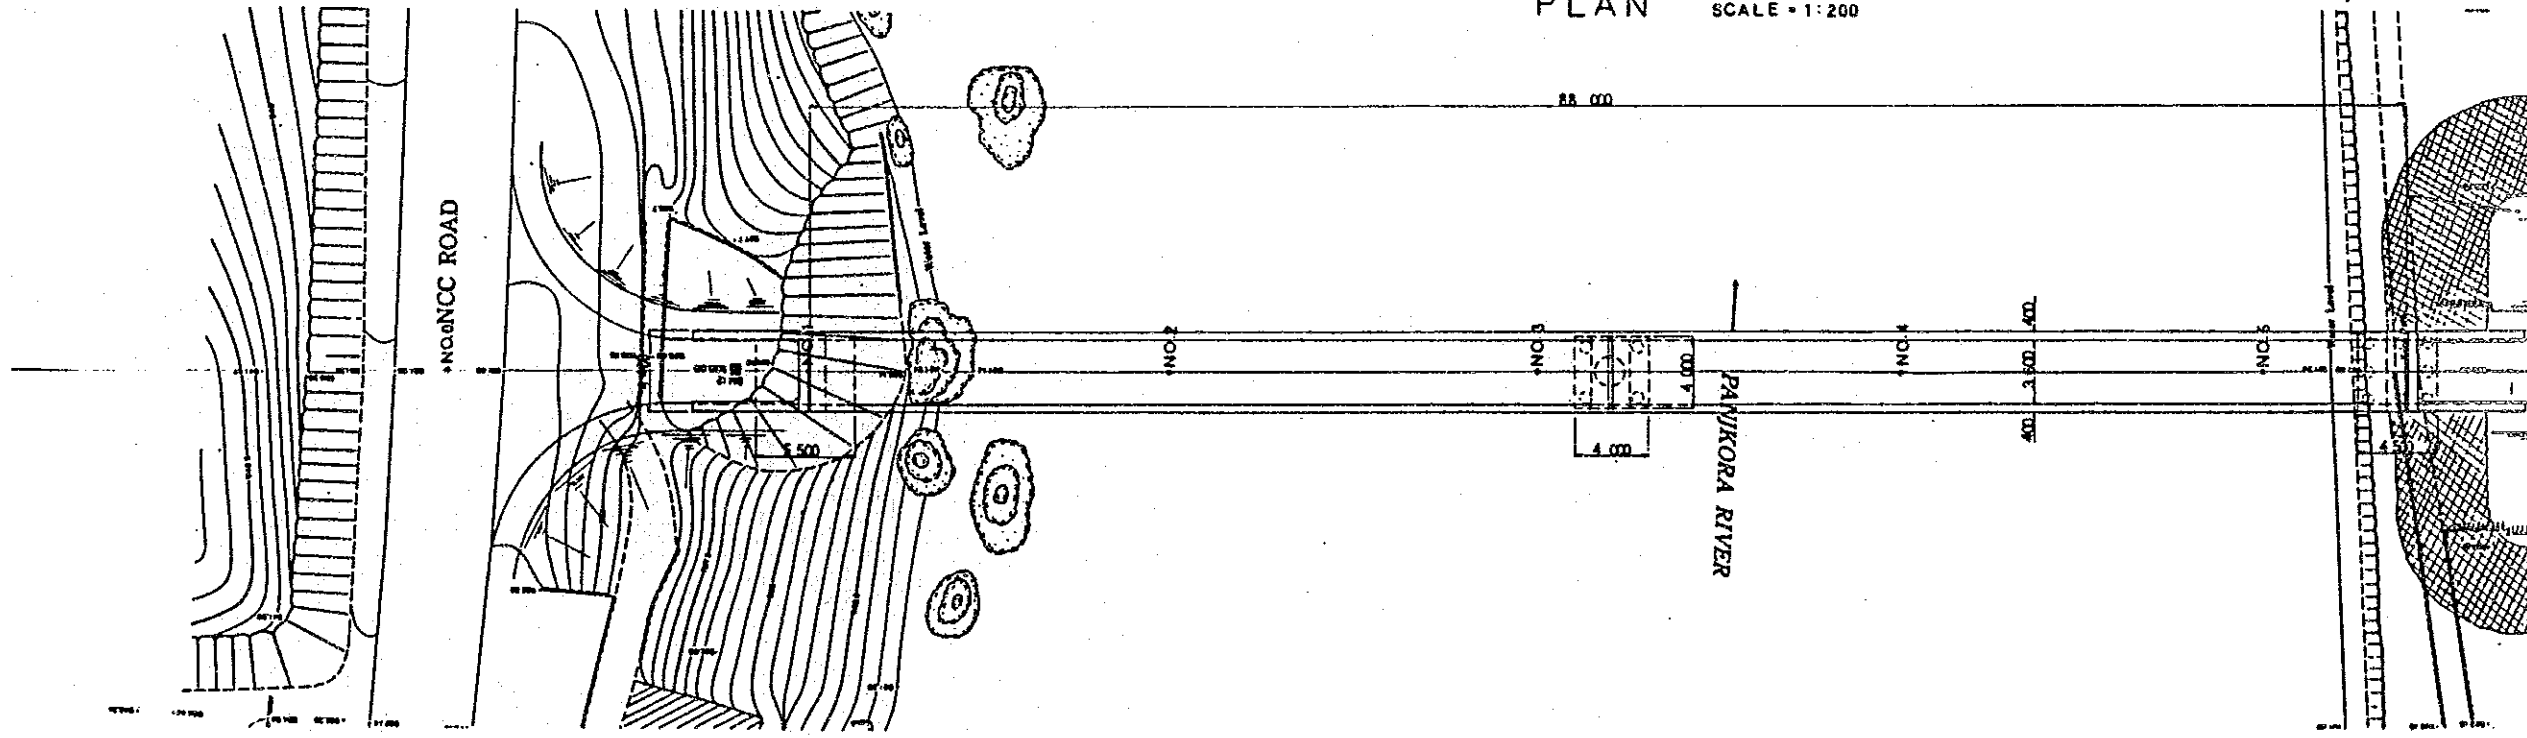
(b) General Layout Plan of the No.11 Choni Bridge (2/2)
